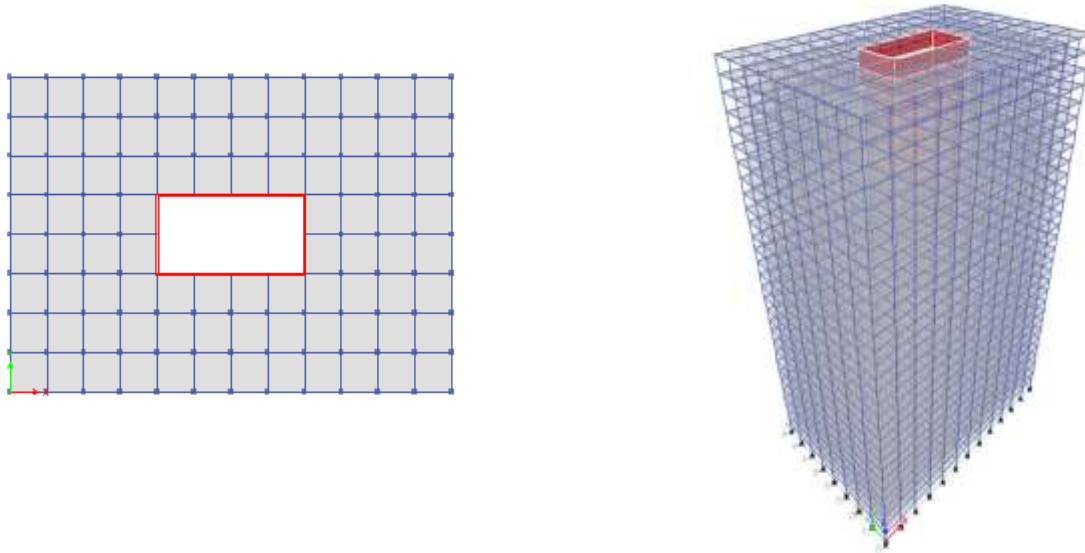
Plan and 3D view of tube in tube structure without bracing
